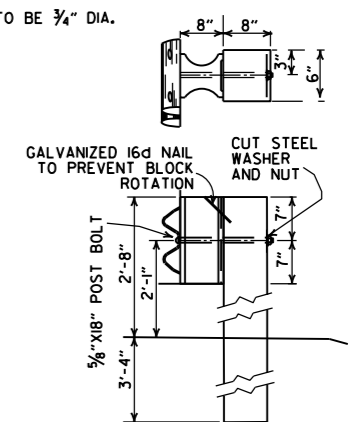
DETAILS OF STEEL LINE POST CONNECTIONS (W-BEAM)
